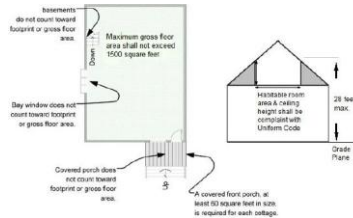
Size of a Cottage at a Cottage Housing Development
